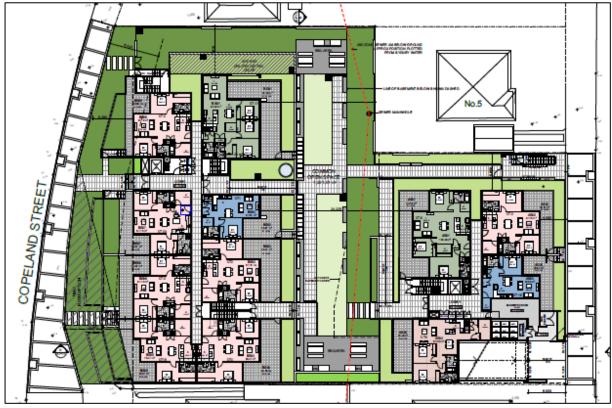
Extract of the ground floor plan presented to the DEP meeting on 20 August 2015
